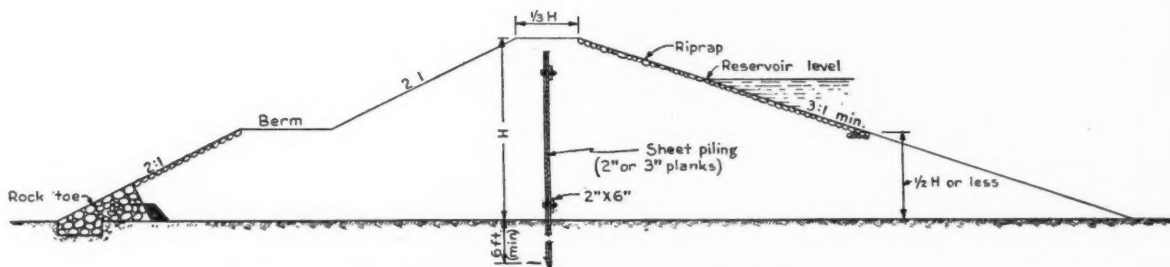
Cross section of earth dams 12 to 20 feet high.
